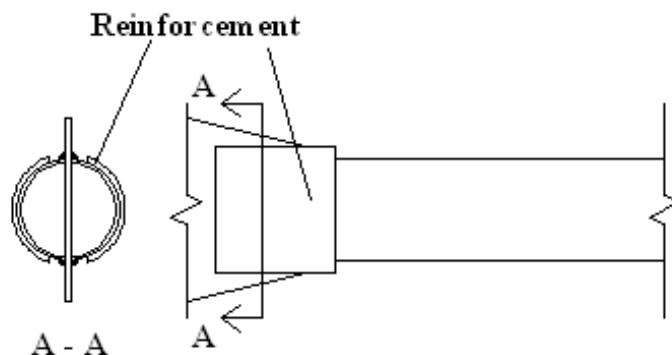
HSS Gusset Plate Connection Reinforcement.
